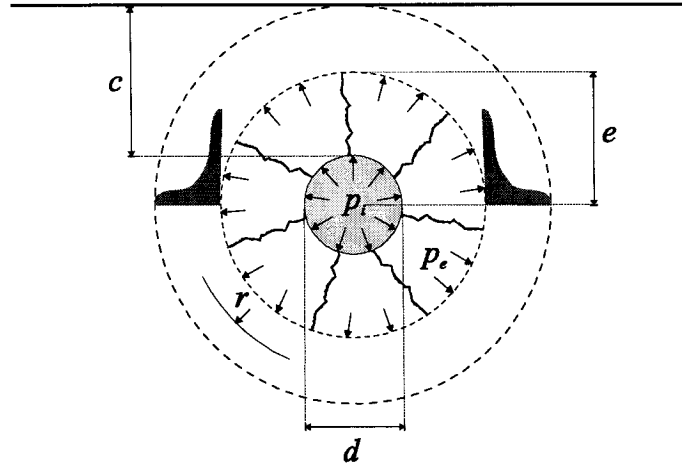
Concrete thick-wall cylinder with internal cracks
